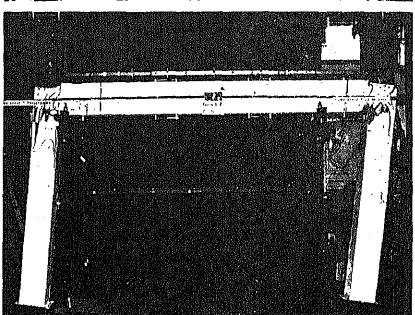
CONCRETE FRAME SHOWN IN FIG. 49 WITH COLLAPSE IMMINENT
